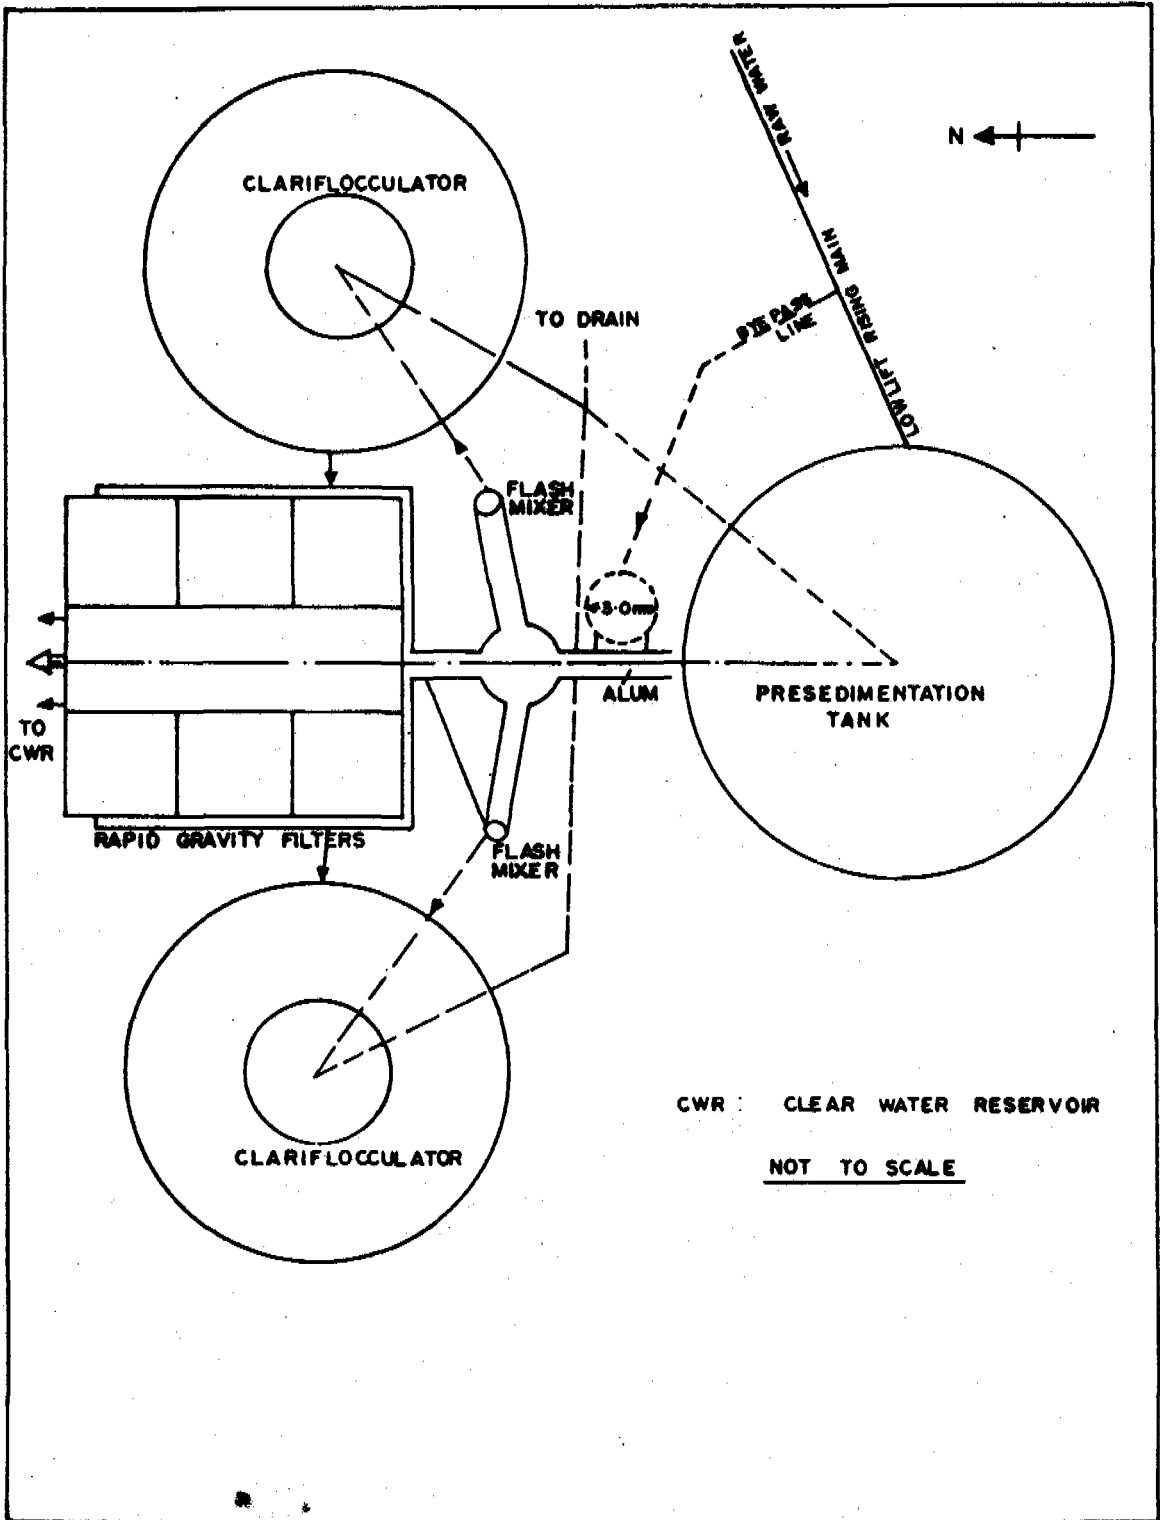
LAYOUT PLAN OF SILLEE WATER TREATMENT PLANT, JAMMU
